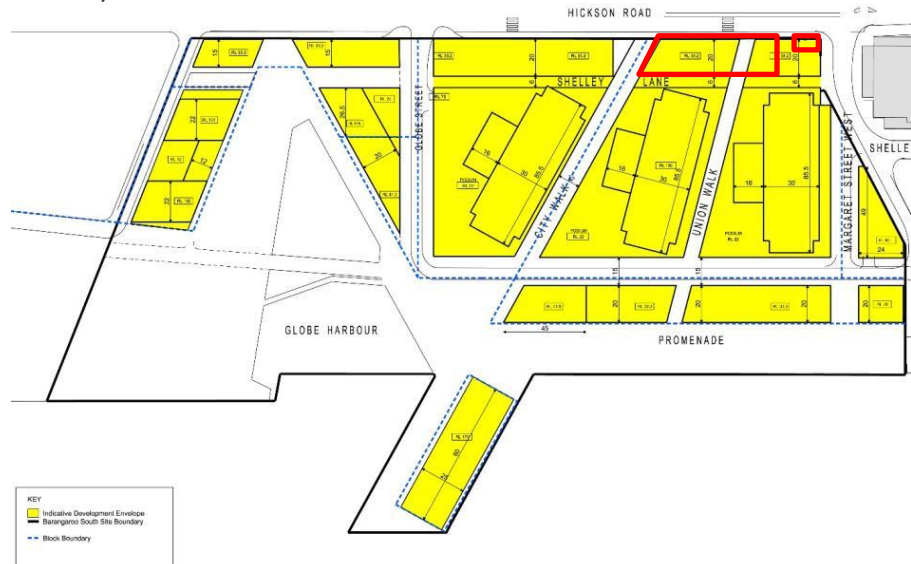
Building C2/C6 ‘Kiosk’ (red outline) in relation to the approved Concept Plan (Mod 7) Indicative Building Layout
